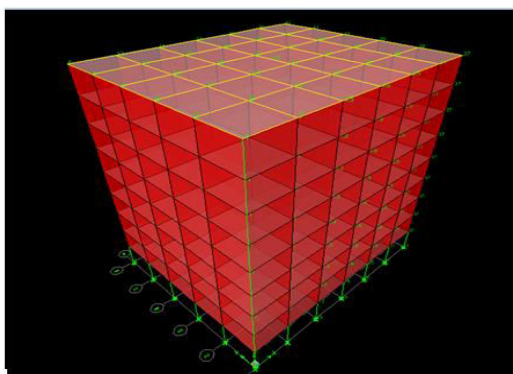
Elevation of nine storeyed Building Model 4 (ground soft)
